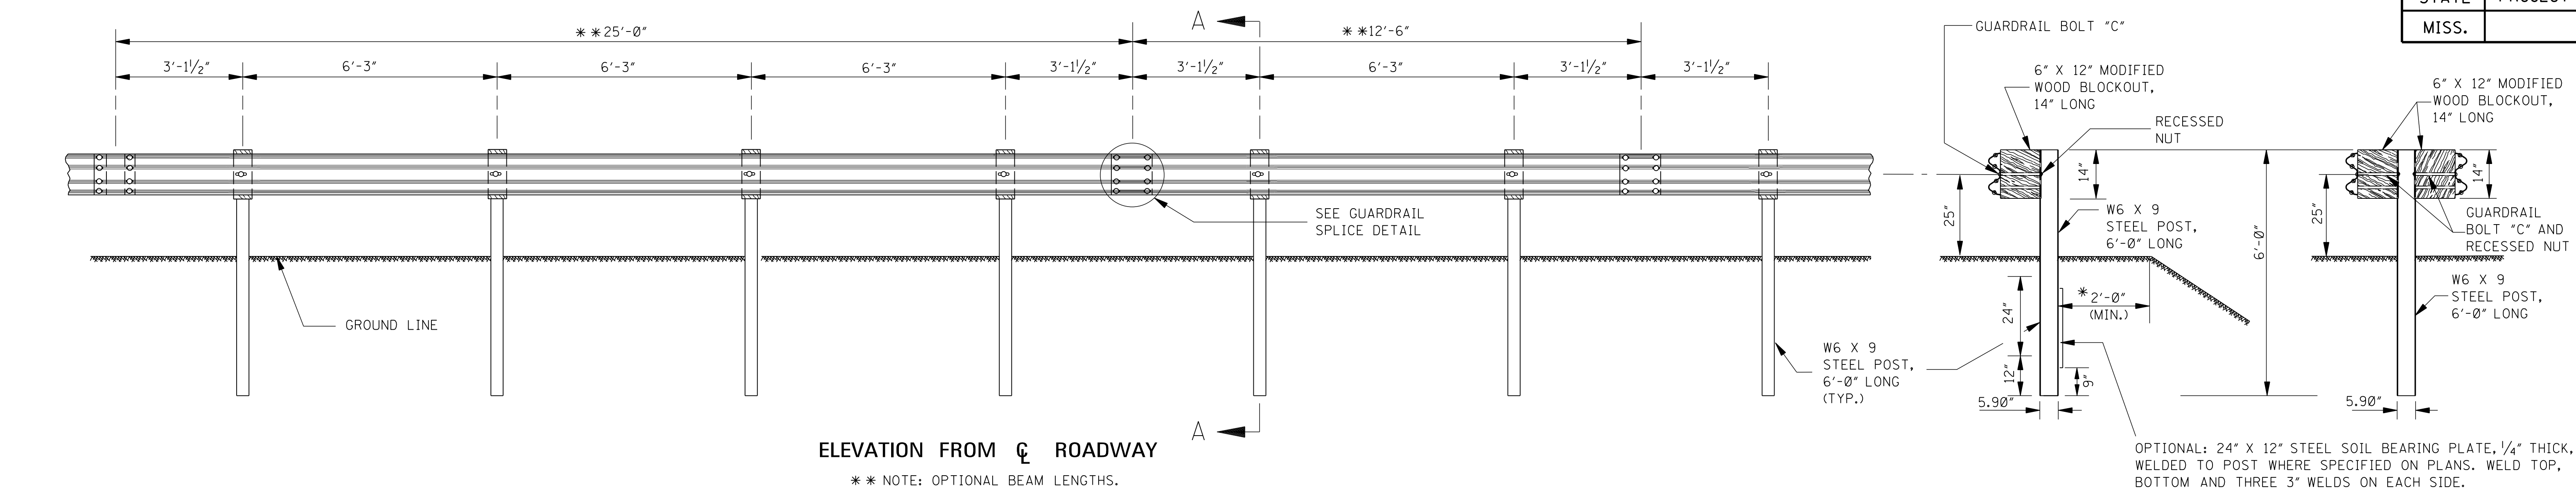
## DETAILS OF ADJUSTABLE HEIGHT BLOCKOUT ASSEMBLY
